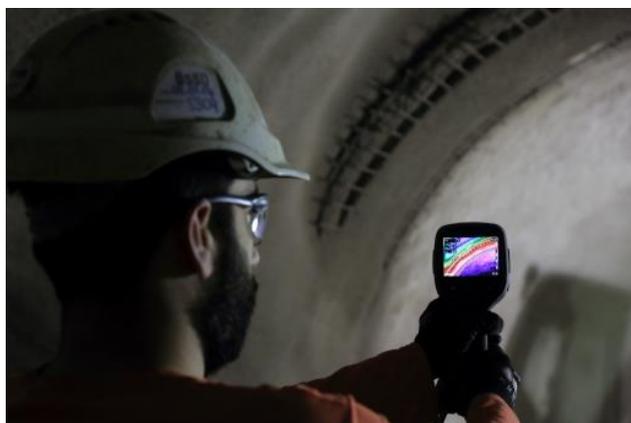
Site engineer using SMUTI to monitor shotcrete strength near the CONCI tunnel headwall at Bond Street Station Upgrade
